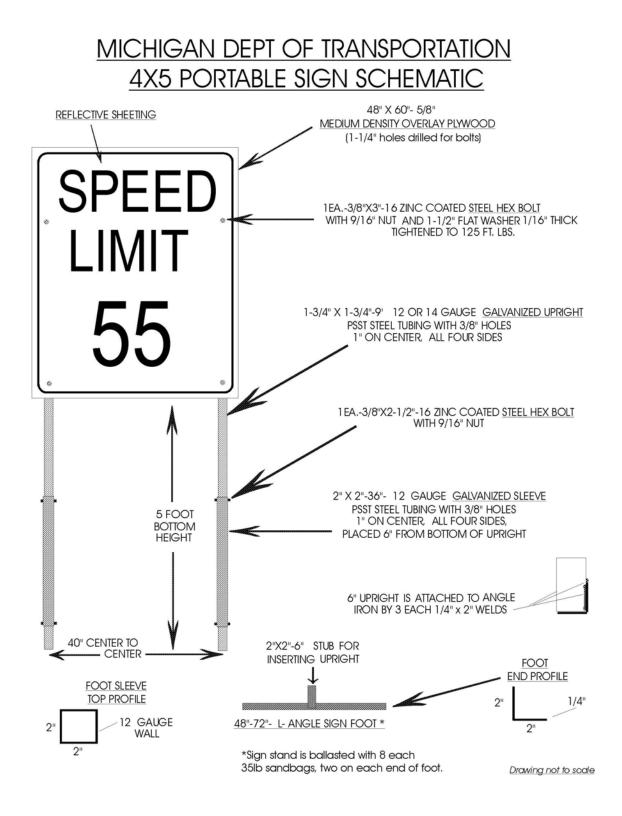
Portable Mounted Rigid Panel System (Test MI-4)
